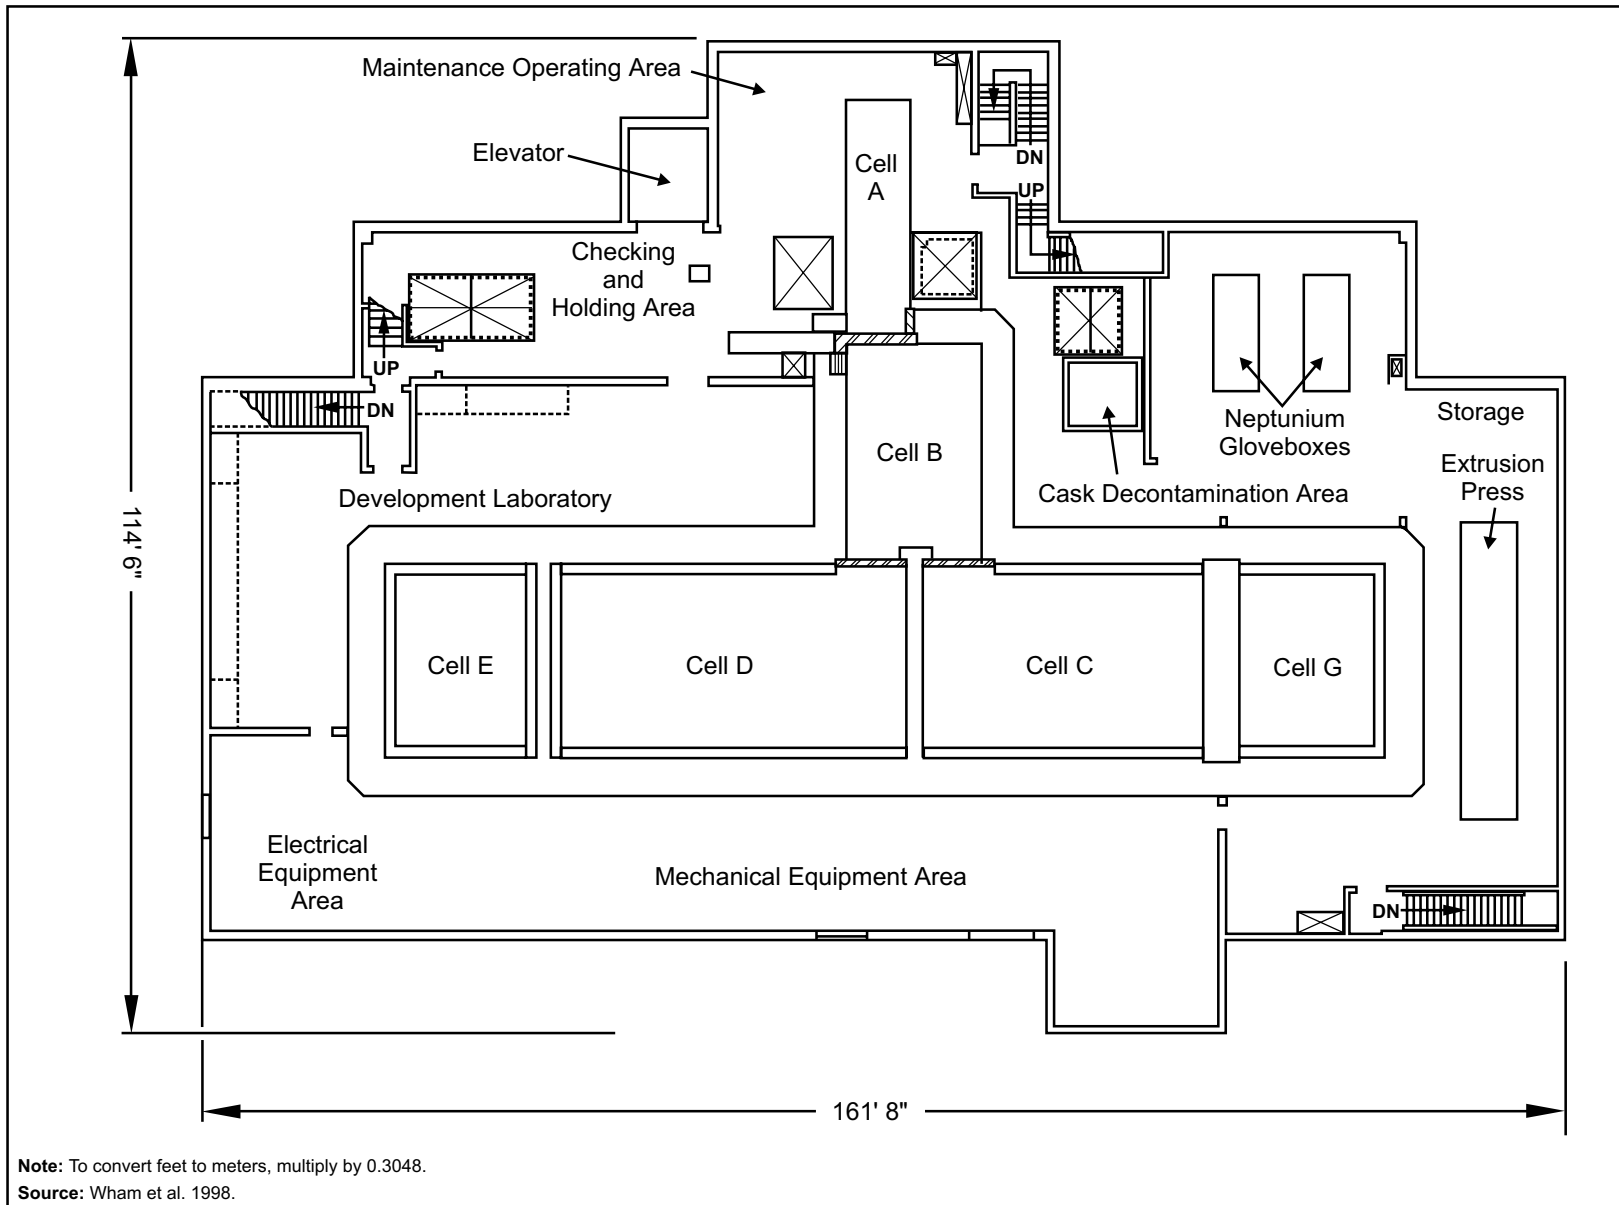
REDC Building 7930 Second Floor Plan View (Cross Section)
